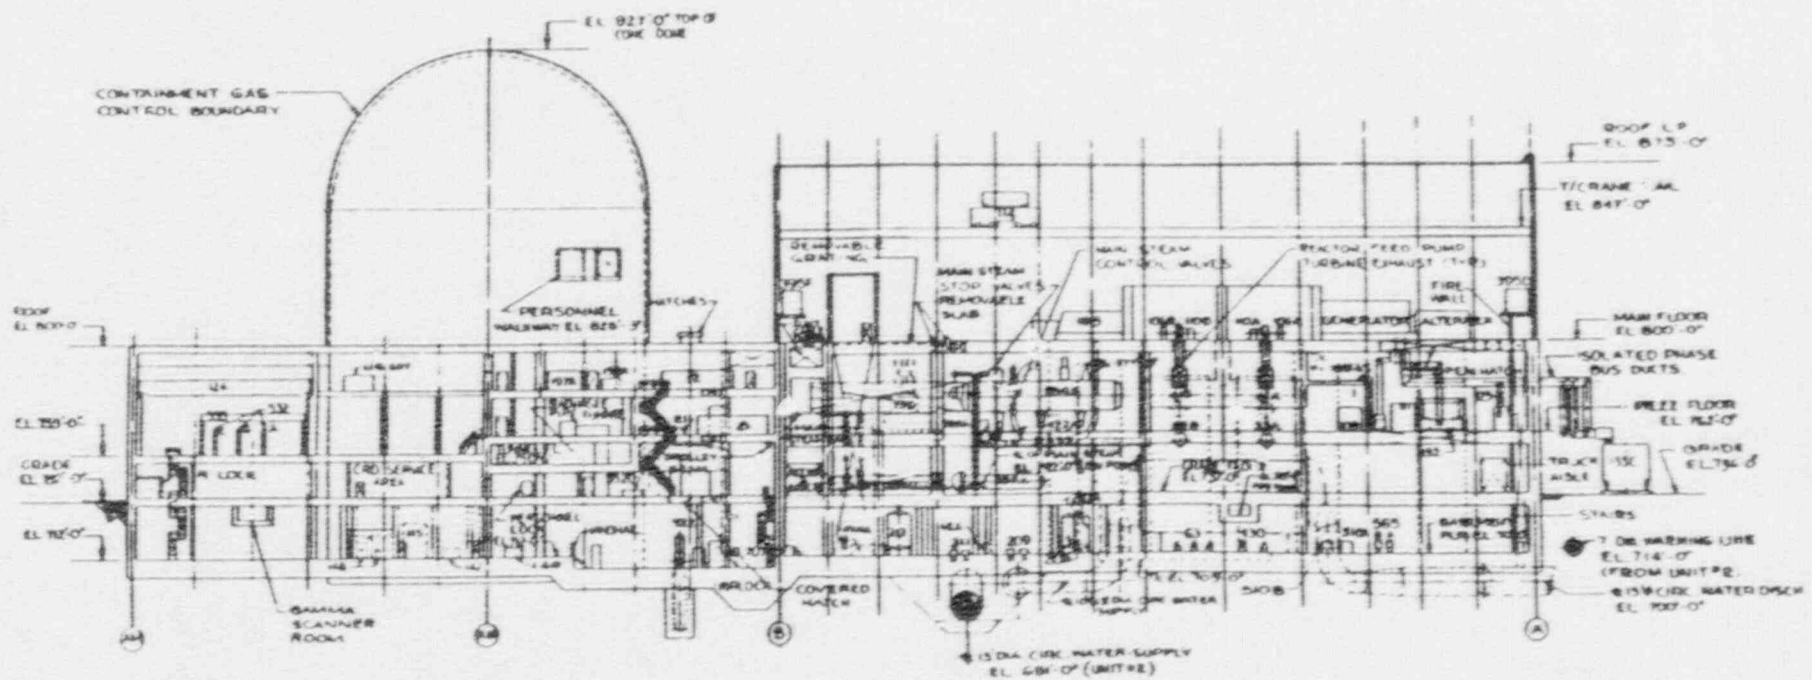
Longitudinal Elevation Views of Clinton 1 Showing Containment, Fuel, Auxiliary and Turbine Buildings (Page 2 of 3)
